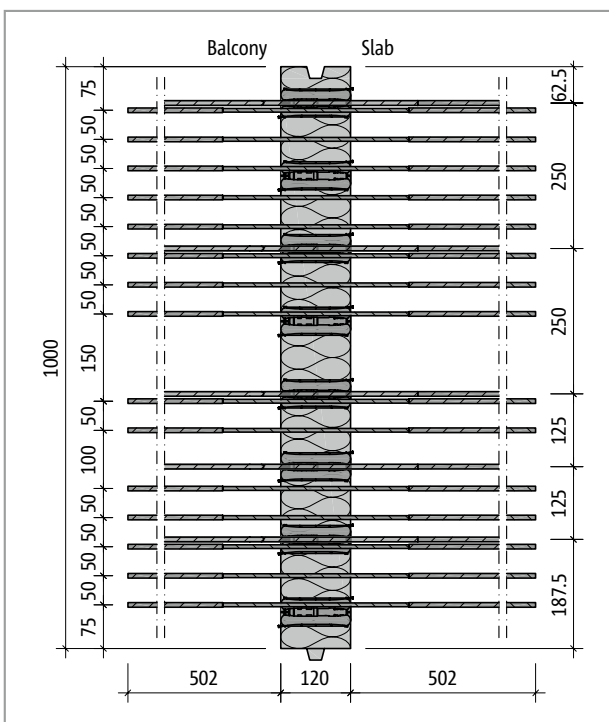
Schöck Isokorb® XT type K-M6: Product plan view
